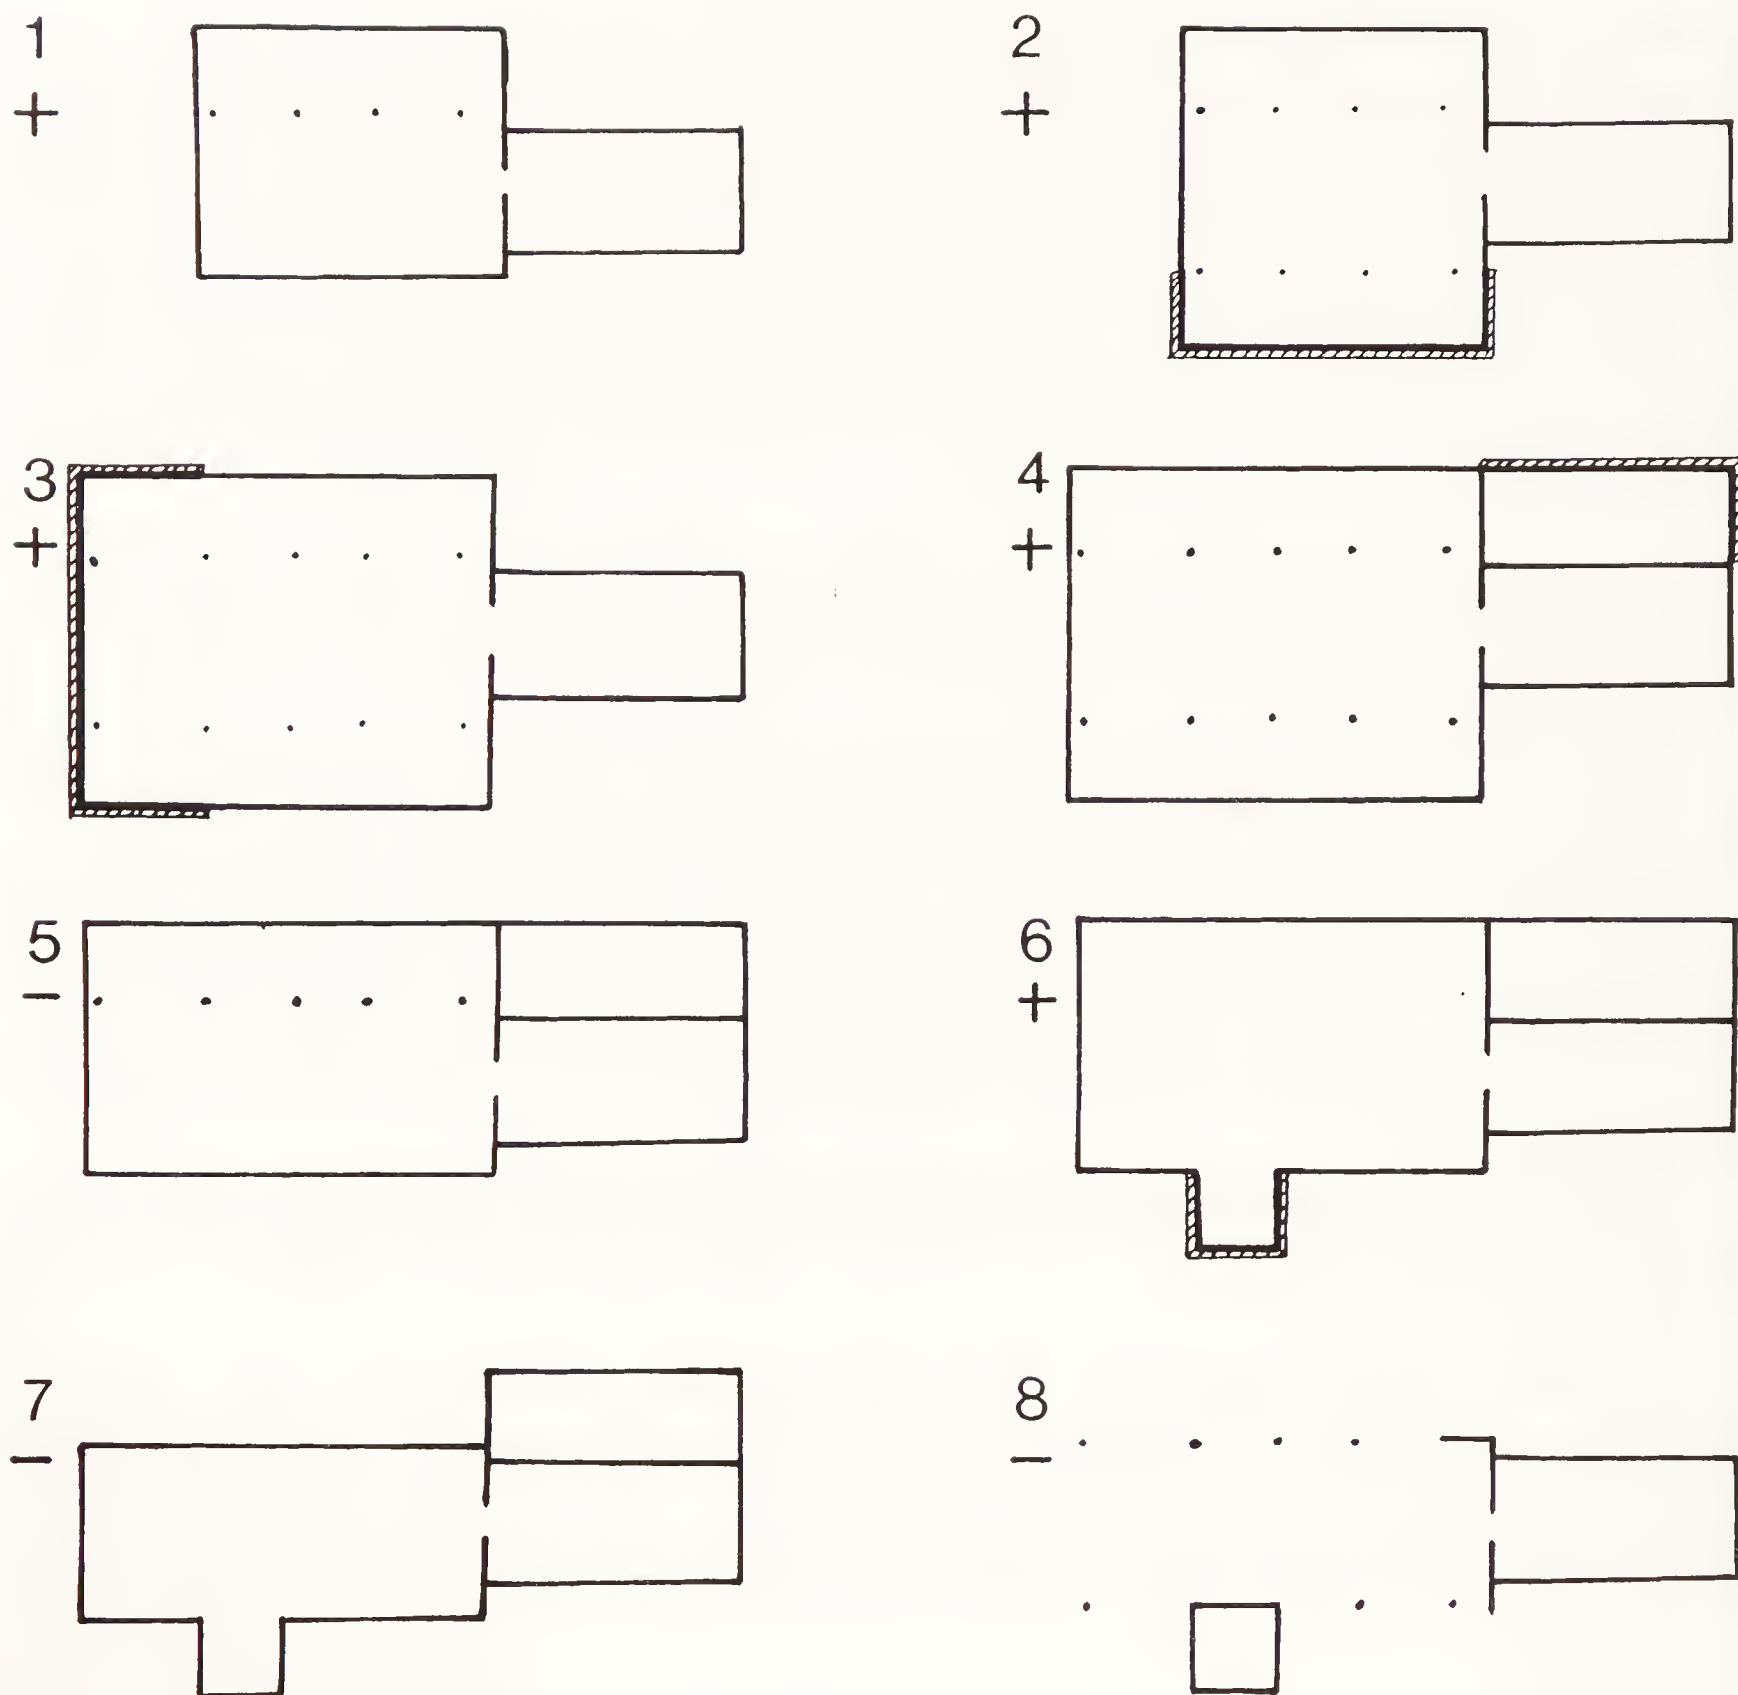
Whorlton Old Holy Cross Church: suggested development of the structure.
